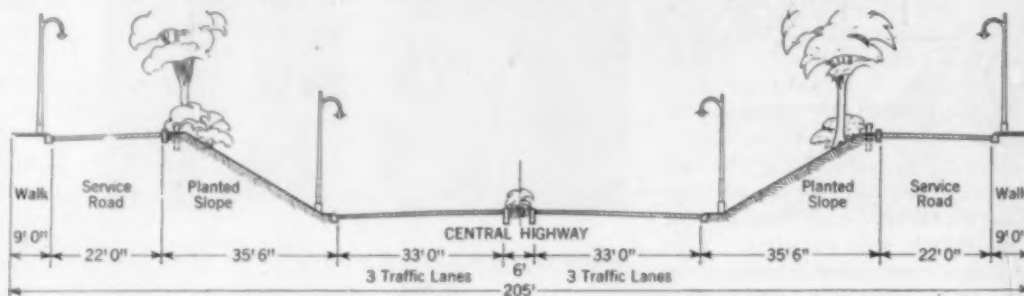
TYPICAL CROSS SECTION OF DAVISON LIMITED HIGHWAY
